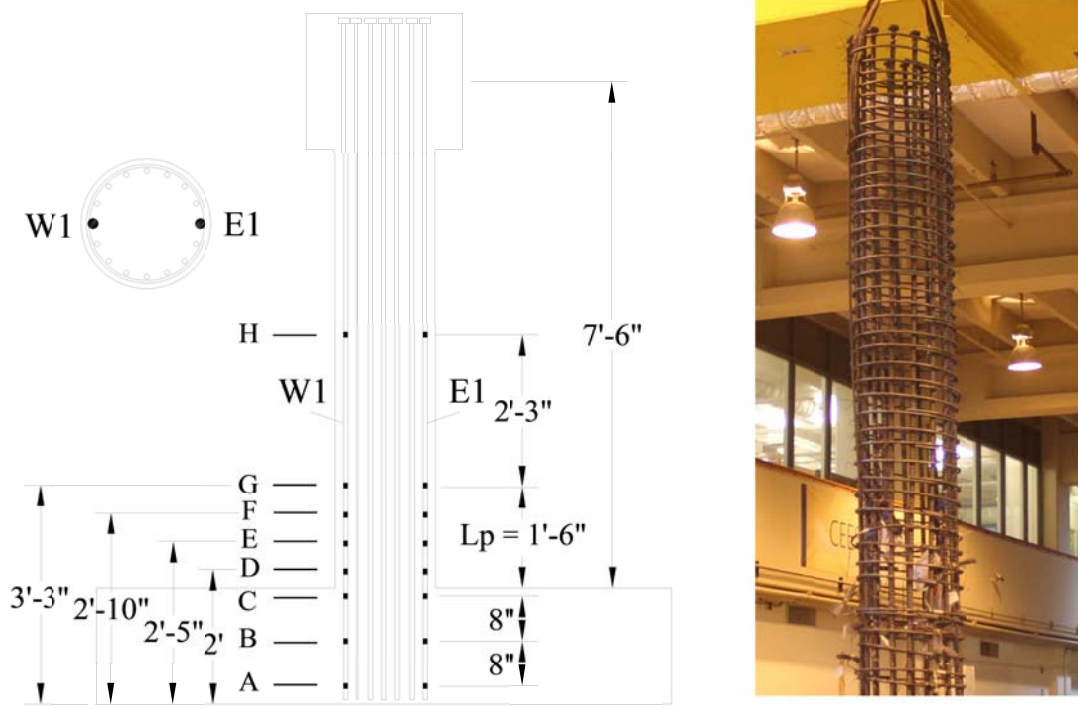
Layout of strain gages used for the column longitudinal and transverse reinforcement
